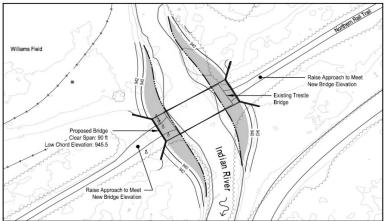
Conceptual site plan for 90-foot clear span bridge at the upstream Rail Trail crossing
